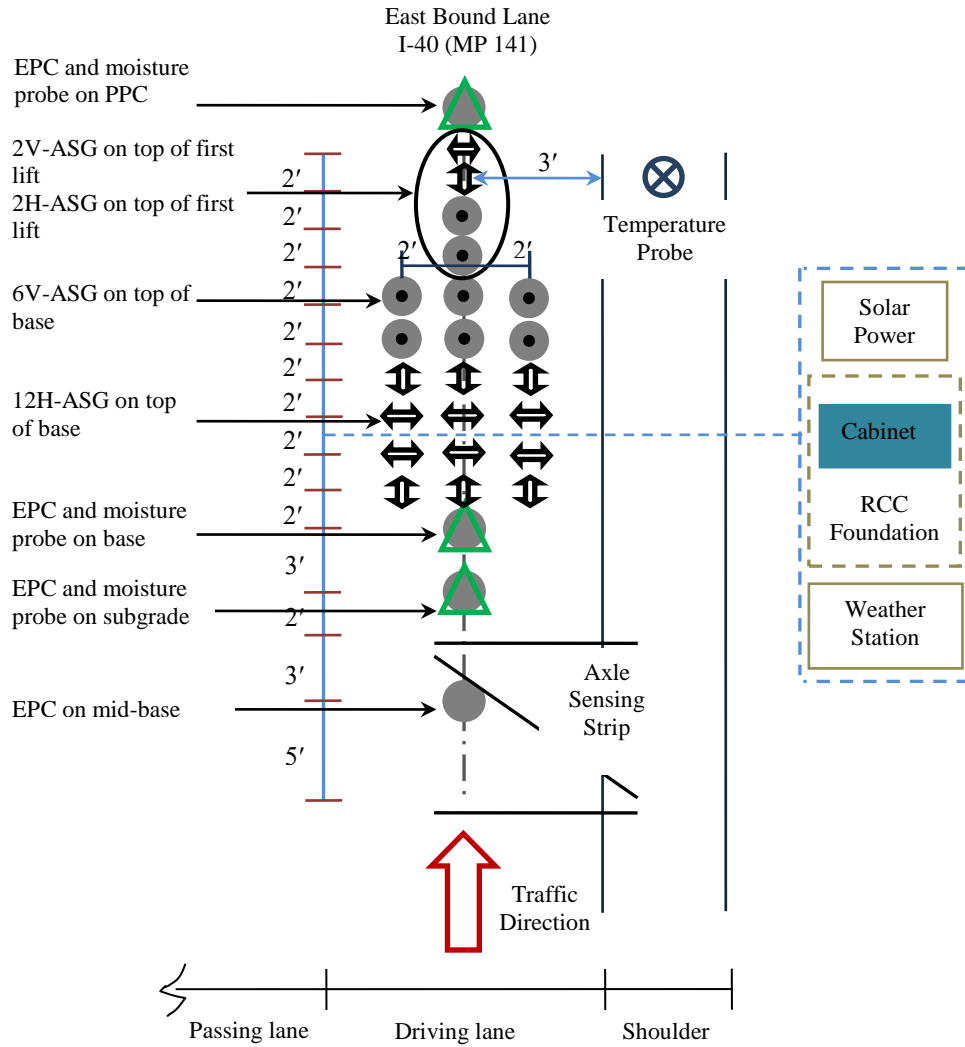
Instrumented Pavement Section (I-40, MP 141)
